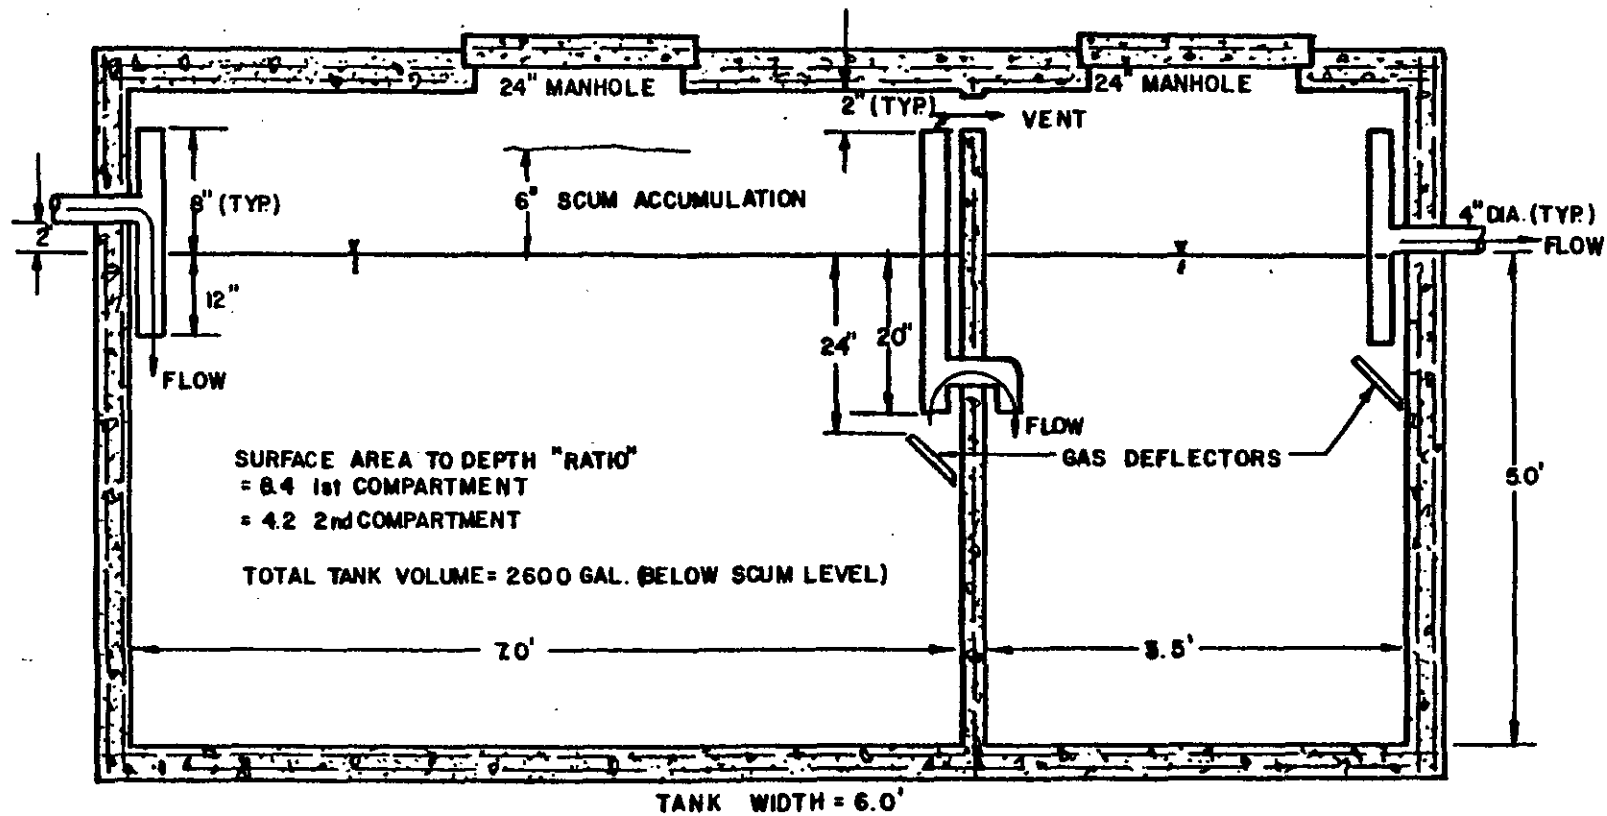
FINAL SEPTIC TANK DESIGN (4 BR. HOUSE)
